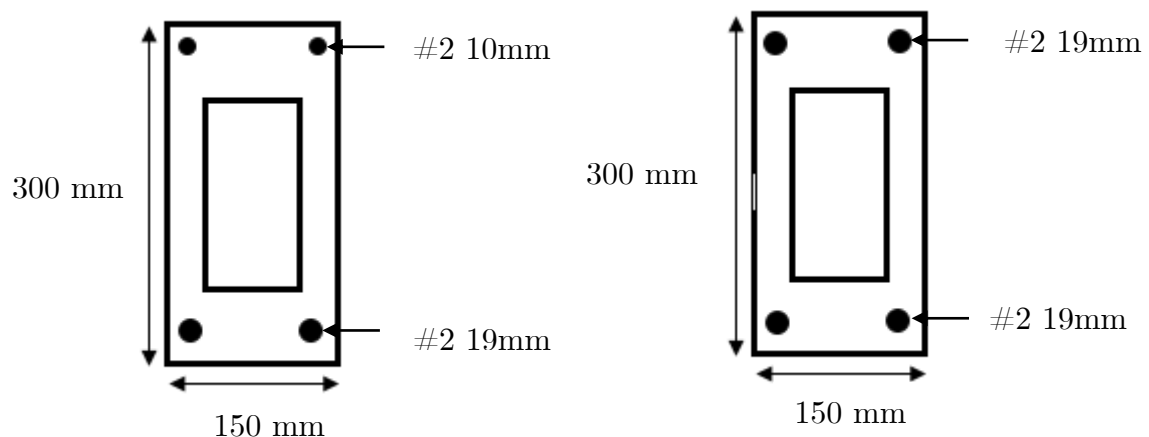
Cross sectional details of McMullan and Warwaruk Specimens
